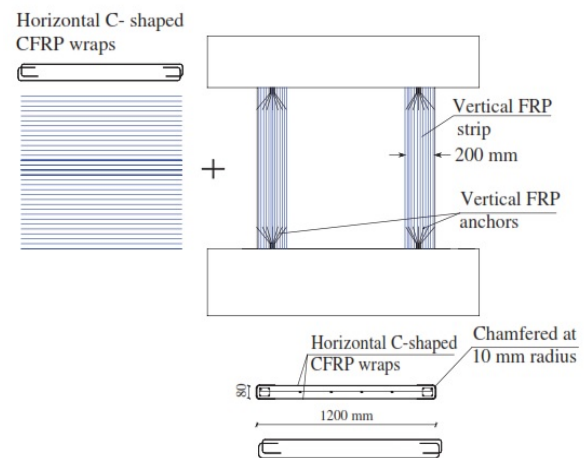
FRP-retrofitted Wall RW1 (El-Sokkary and Galal, 2013)
